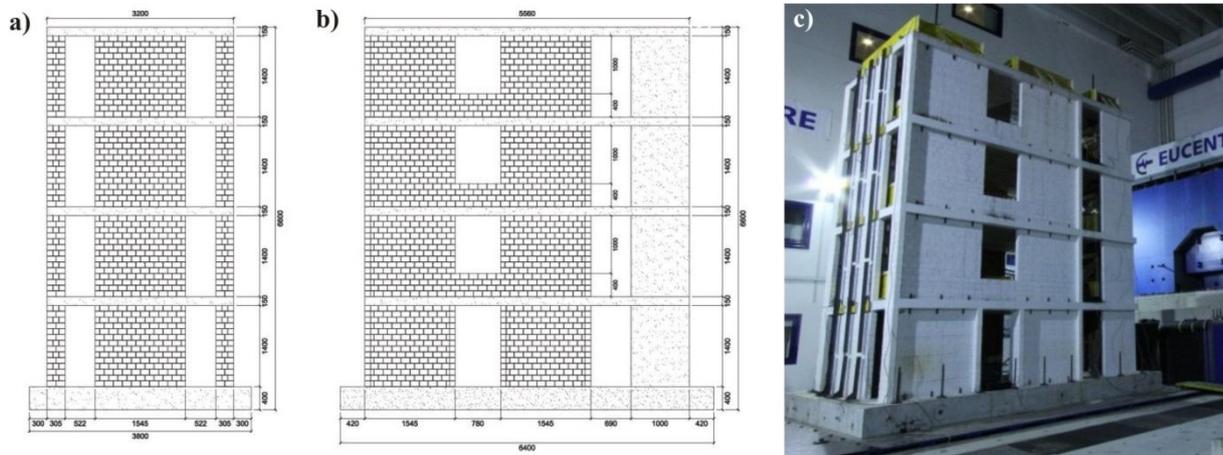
Test specimen: a) North view, b) West view and c) test specimen on the shake table.
